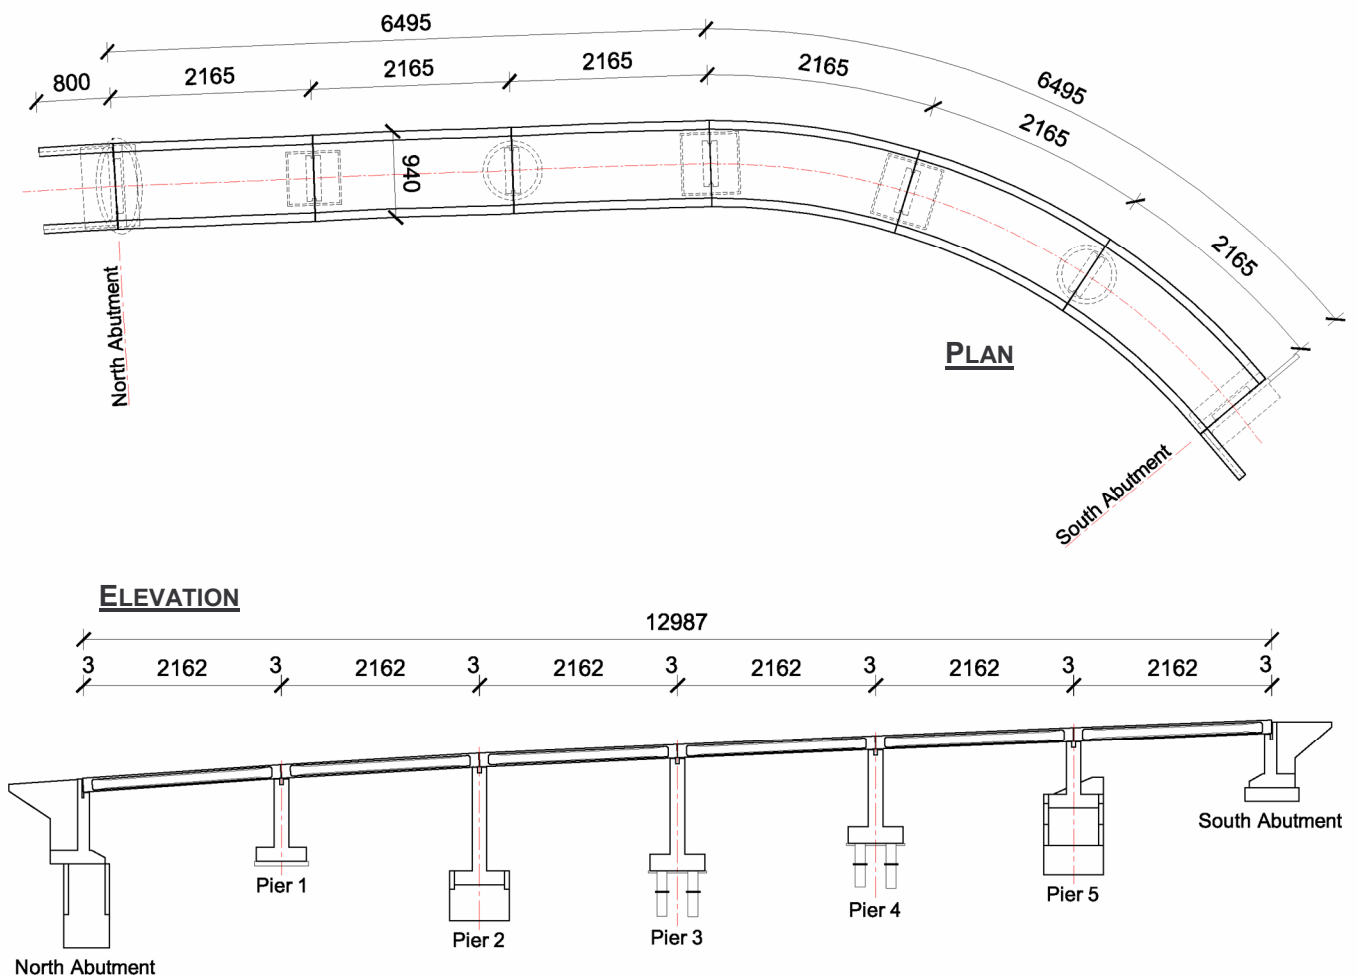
"Carrodano" viaduct: plan and elevation (dimensions in cm)
